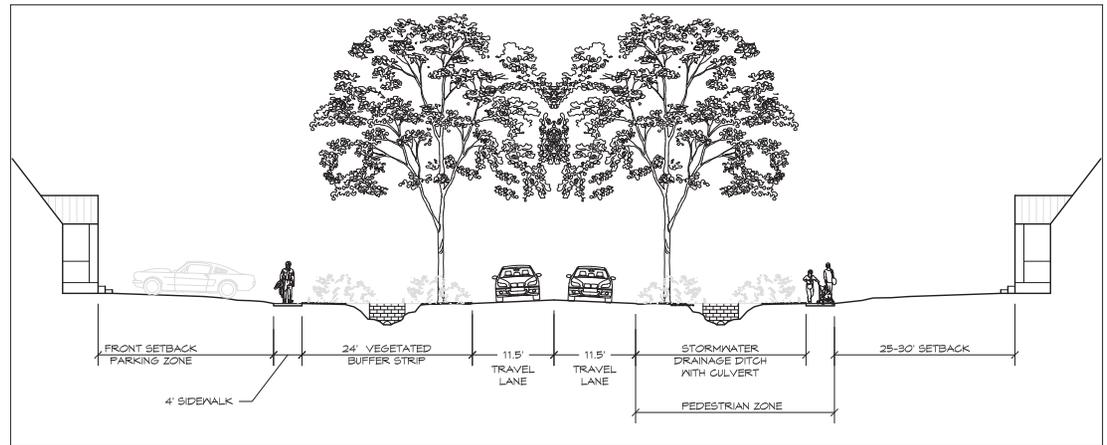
A CROSS-SECTION OF THE RESIDENTIAL STREETScape TYPE A (STOCKER DRIVE).
